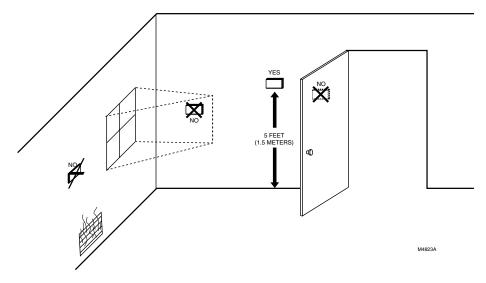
Typical location of thermostat or remote-mounted sensor.
